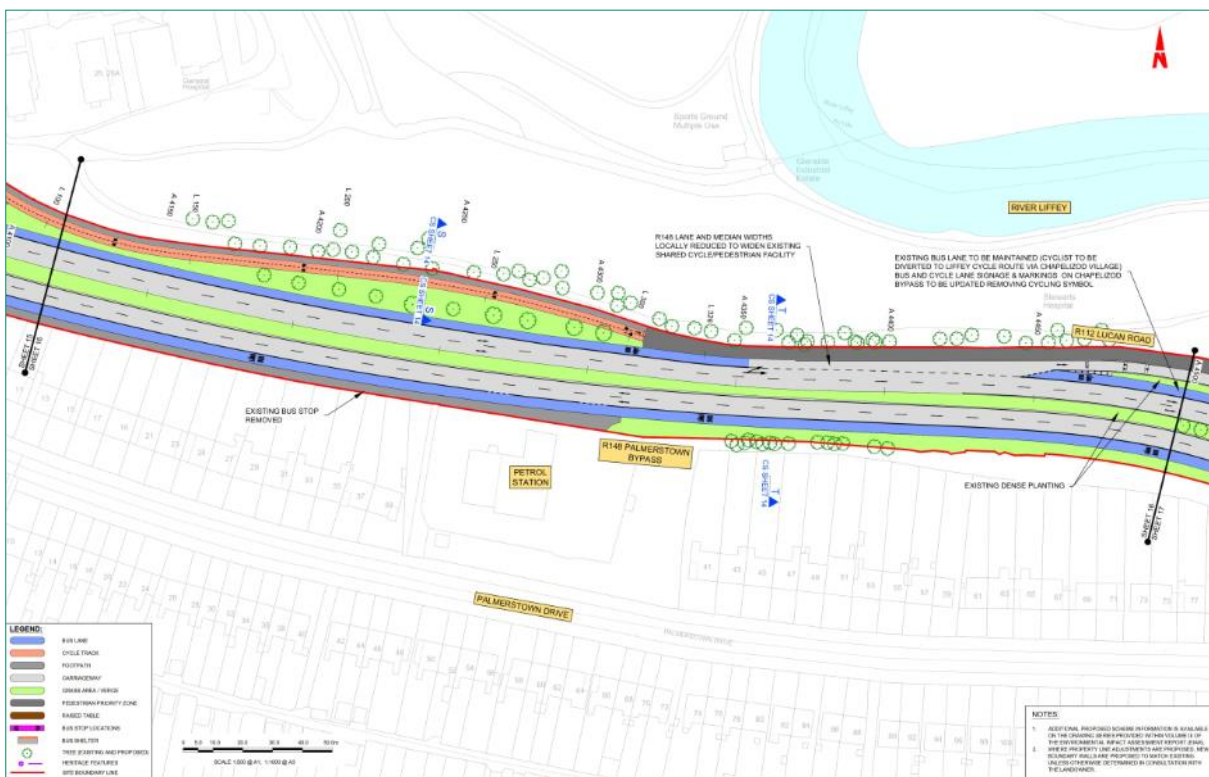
Extract 6 from General Arrangement Drawing (Sheet 16)
